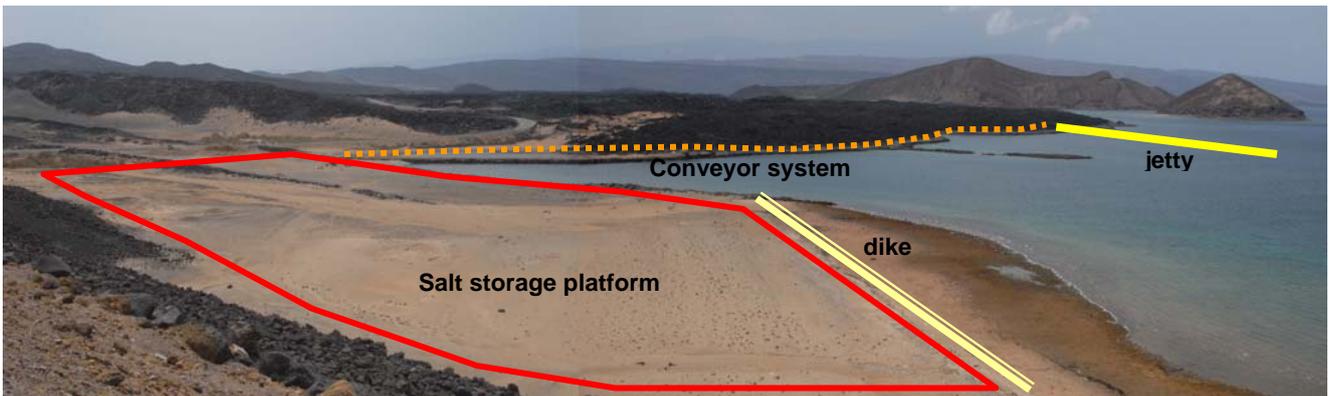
Beach area to be used for salt storage. Location of the conveyor system and jetty for loading onto the ship is also indicated.
